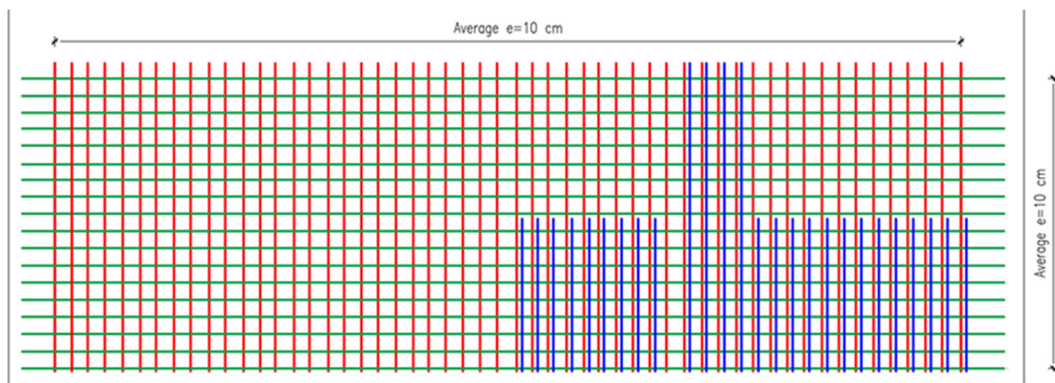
Plan view of test results: position of the horizontal and vertical reinforcement.
